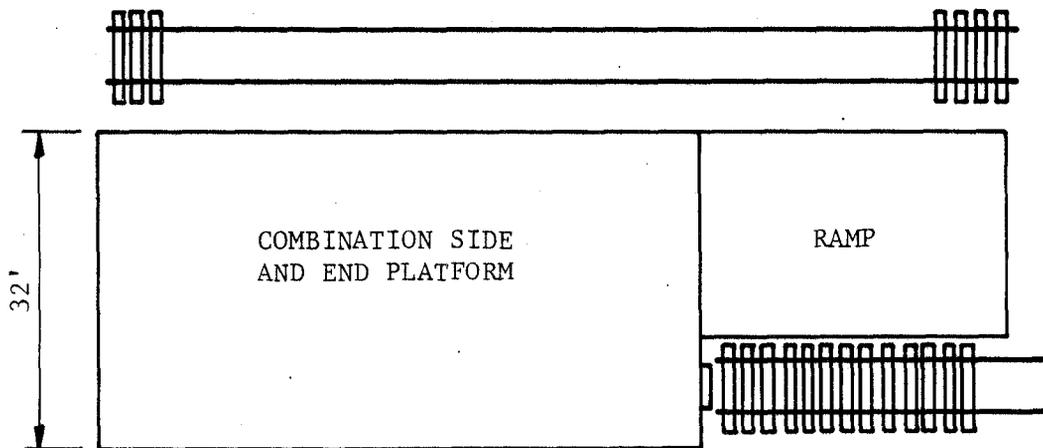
OPEN STORAGE AREA LAYOUT SHOWING STREET AND TRACK ACCESS
